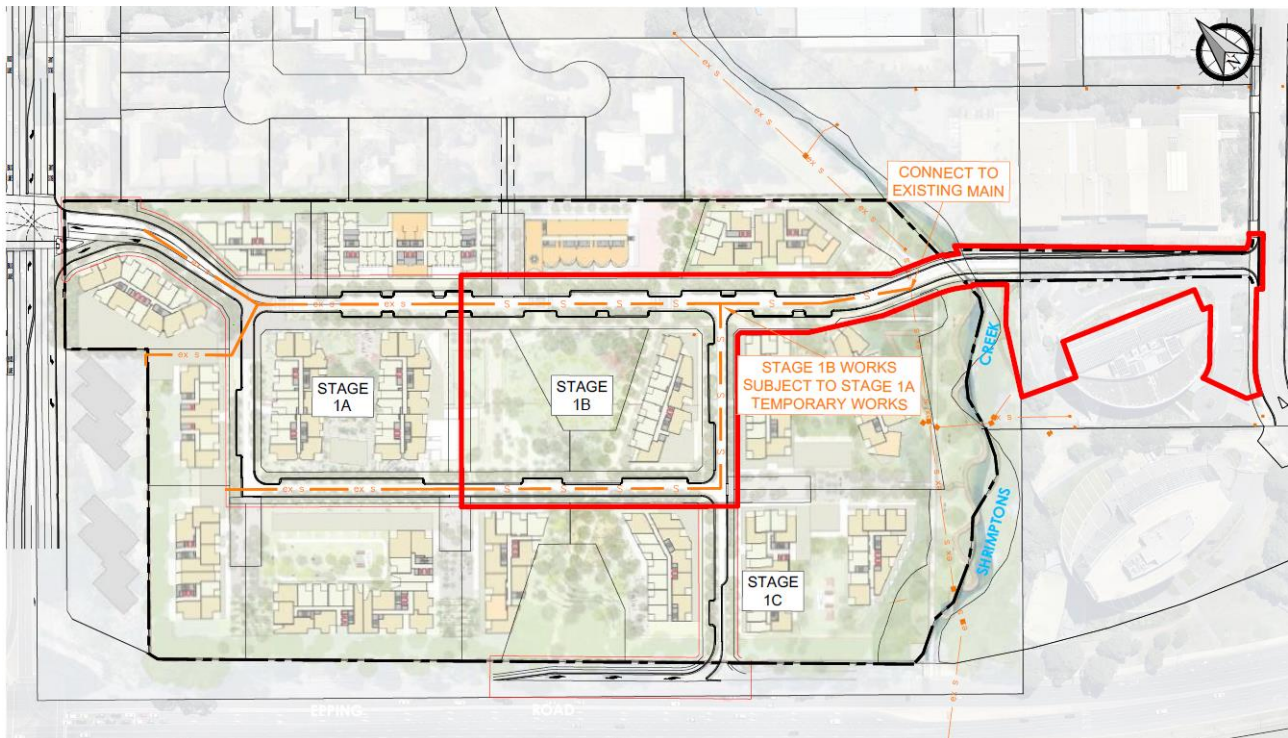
Indicative Stage 1B Sewer Layout
